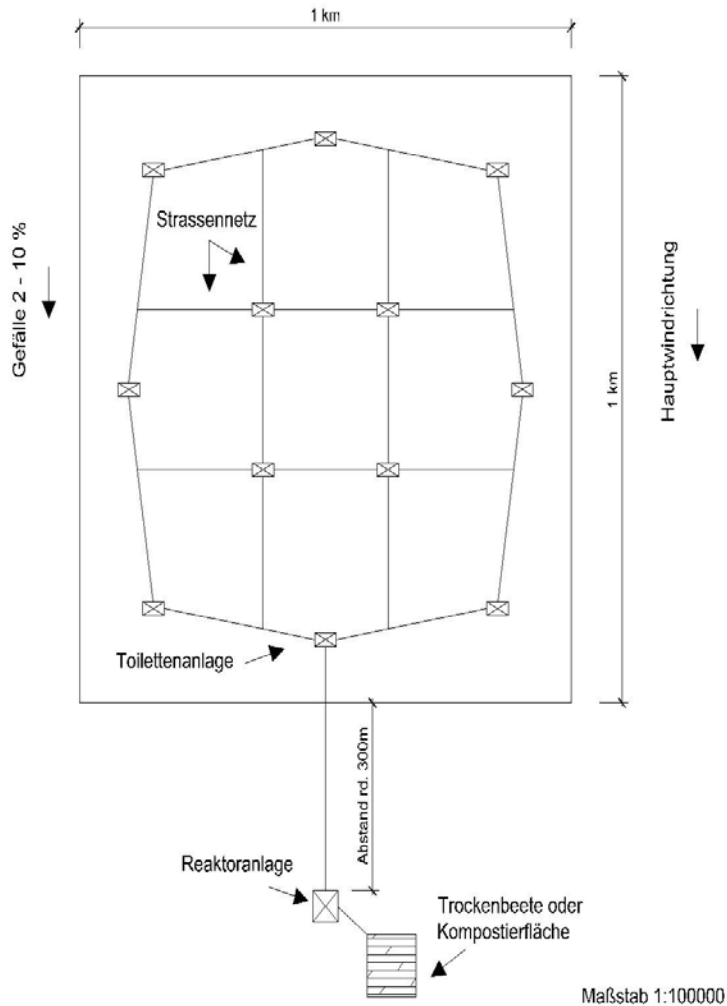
Possible arrangement of sanitary areas and treatment facilities, central and external
